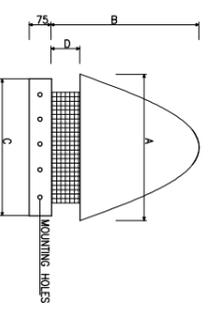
DETAILS OF THE INSTALLATION OF THE ROOF MOUNTED UTILITY VENT SET
